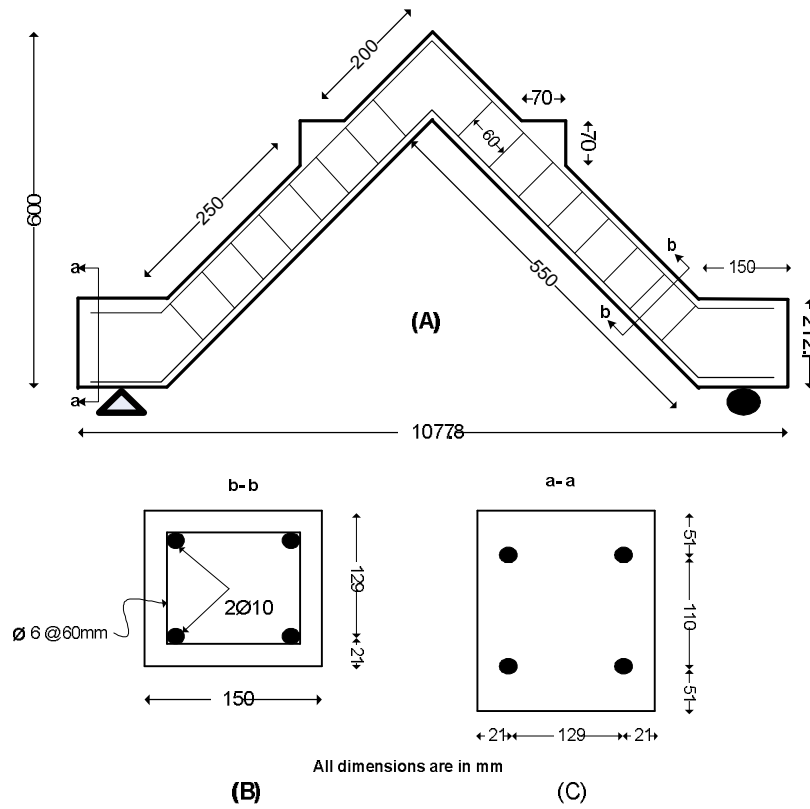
, Details of Tested Corners: (A) Overall Dimensions (B) Leg Cross Section (C) Corner Base Cross Section
